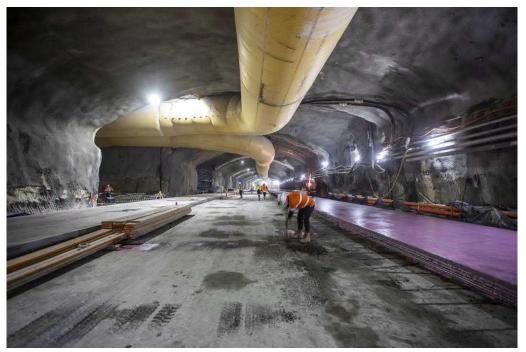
Continuously Reinforced Concrete Pavement (CRCP) paving works at PBR in July 2020
